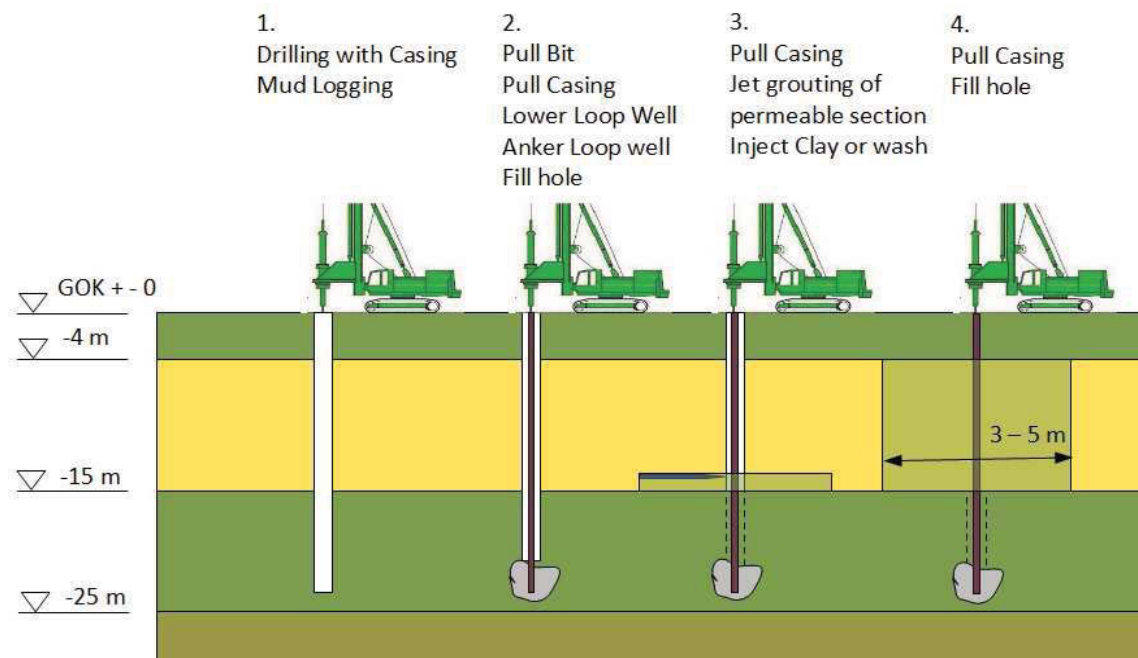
Sketch of constructing a jet grouted body with an internal loop well in one step
